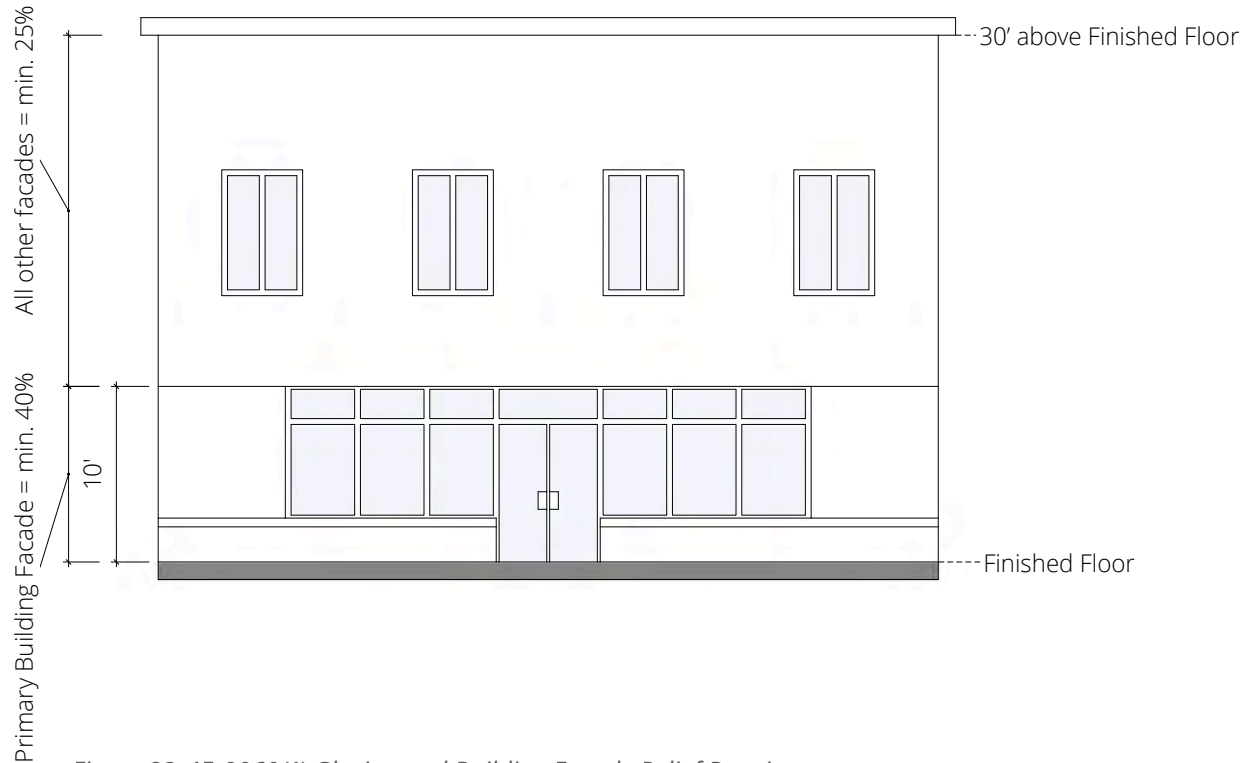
E-8060(1) Glazing and Building Facade Relief Requirements
